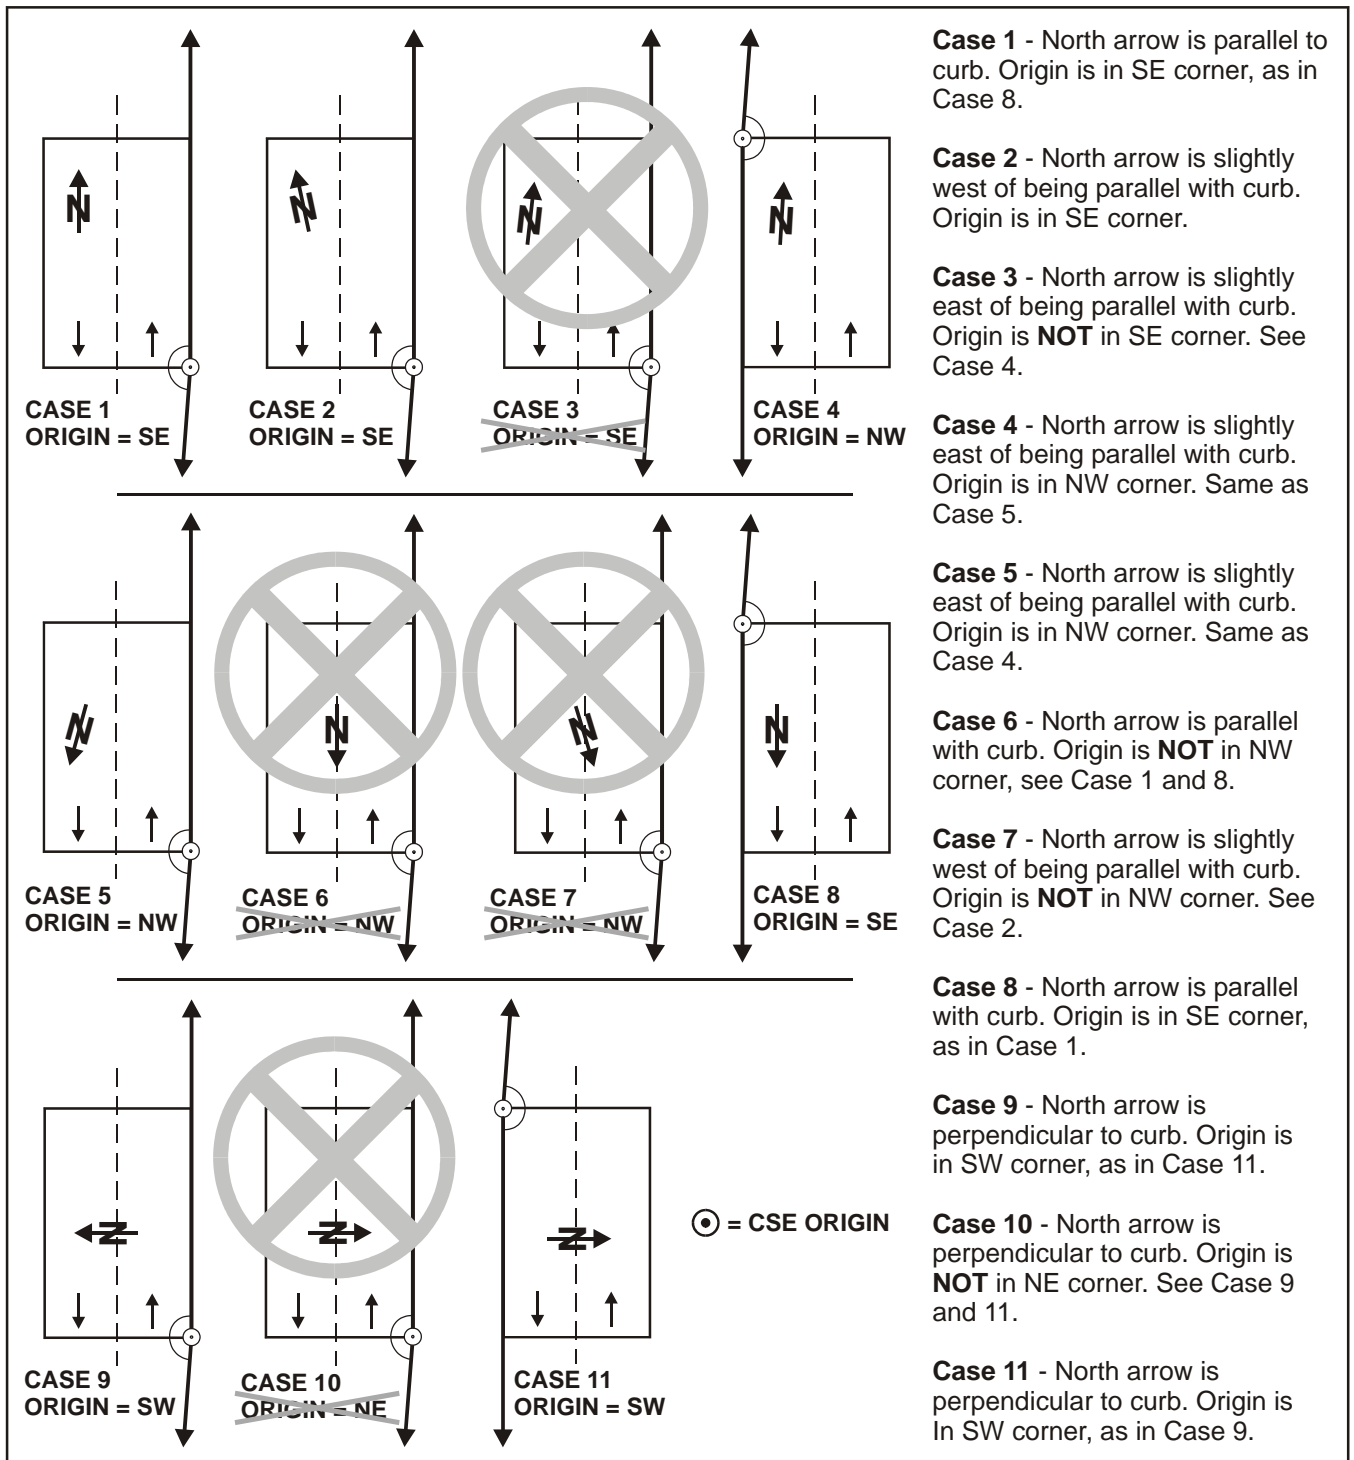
The Origin Point for CSE Testing, Detailed Examples
